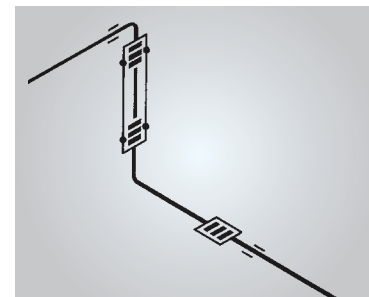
3-dimensional three-hinge system with lateral and angular expansion joints
